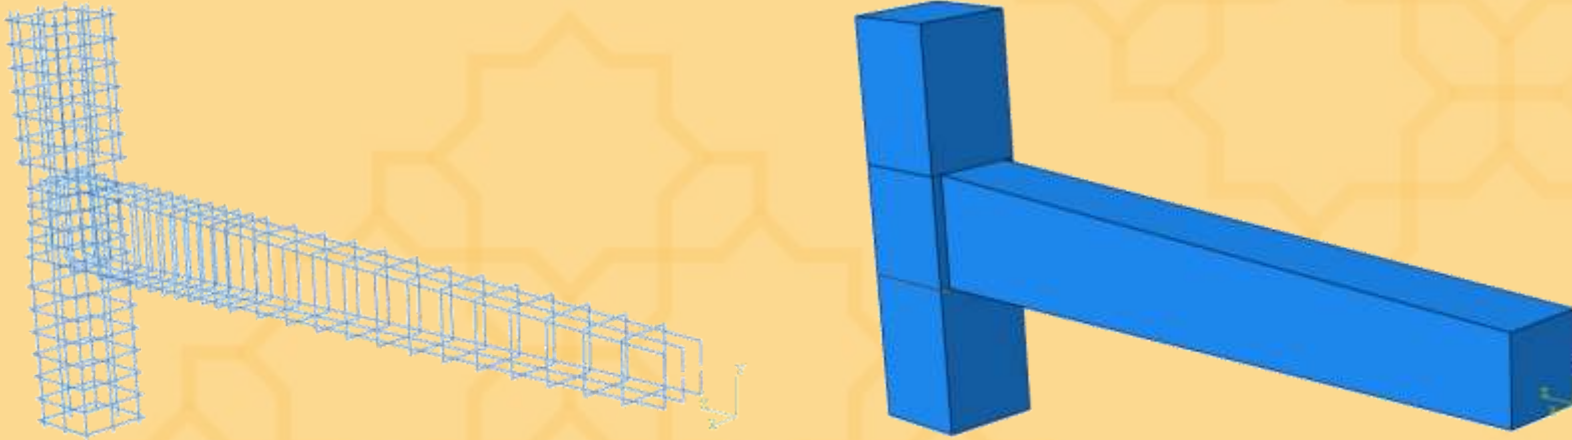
Detail of Cantilever beam sample 2 (BK-2)
